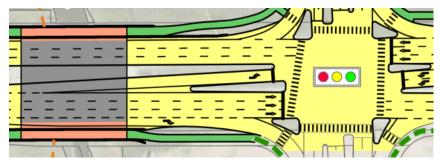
Nose Creek Bridge and 11 Street N.E.
